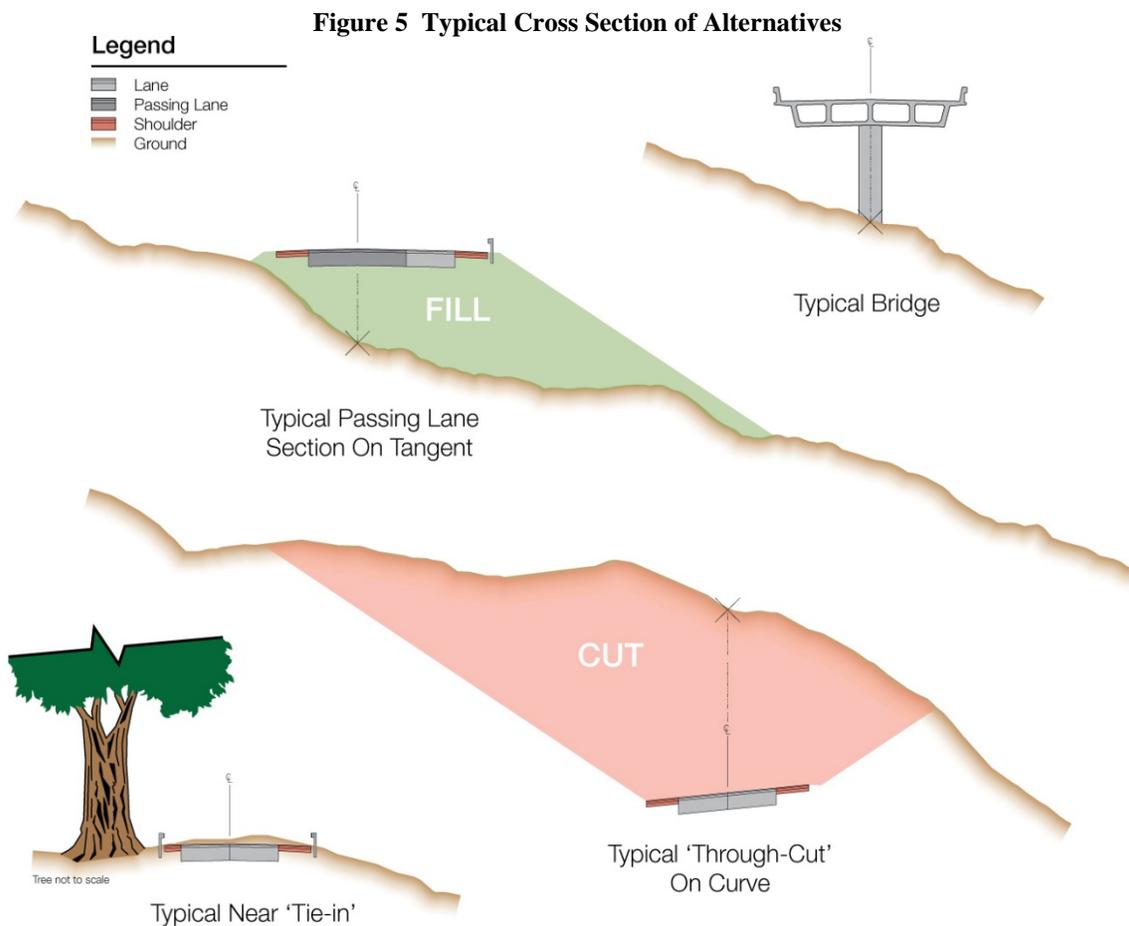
shows the typical cross section of some of the proposed alternatives representing different locations along each alternative. The upper right diagram shows a typical bridge, or viaduct, being proposed for Alternatives A2 and B2 and the reduced footprint and associated environmental impacts compared to using road cut and fill. The fill diagram (upper left) shows how the width of the roadway increases when adding a passing lane and thus increasing the overall footprint of the roadway. The cut diagram (lower right) shows how the cut slope ratio (1.5:1) can increase/decrease the overall footprint of a roadway. The lower left diagram shows how reducing shoulder width on tie-in segments can eliminate the need to take large trees, such as old-growth redwood.
